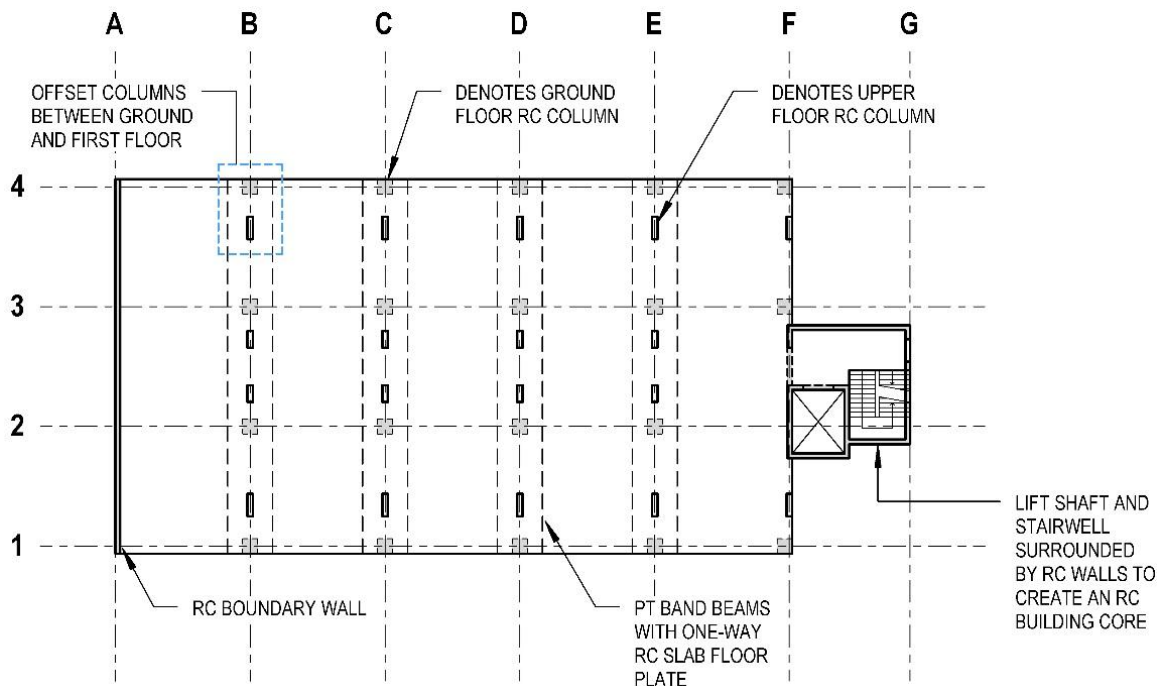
Category 2 building with RC walls as the dominant lateral load resisting systems.
